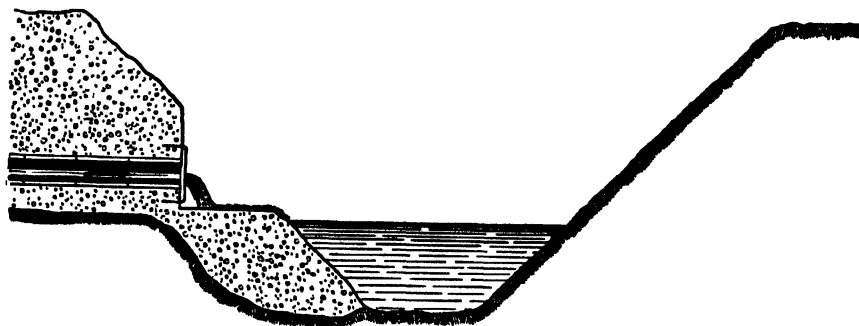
Showing method of embedding ordinary drain tile in concrete to form opening into ditch.
